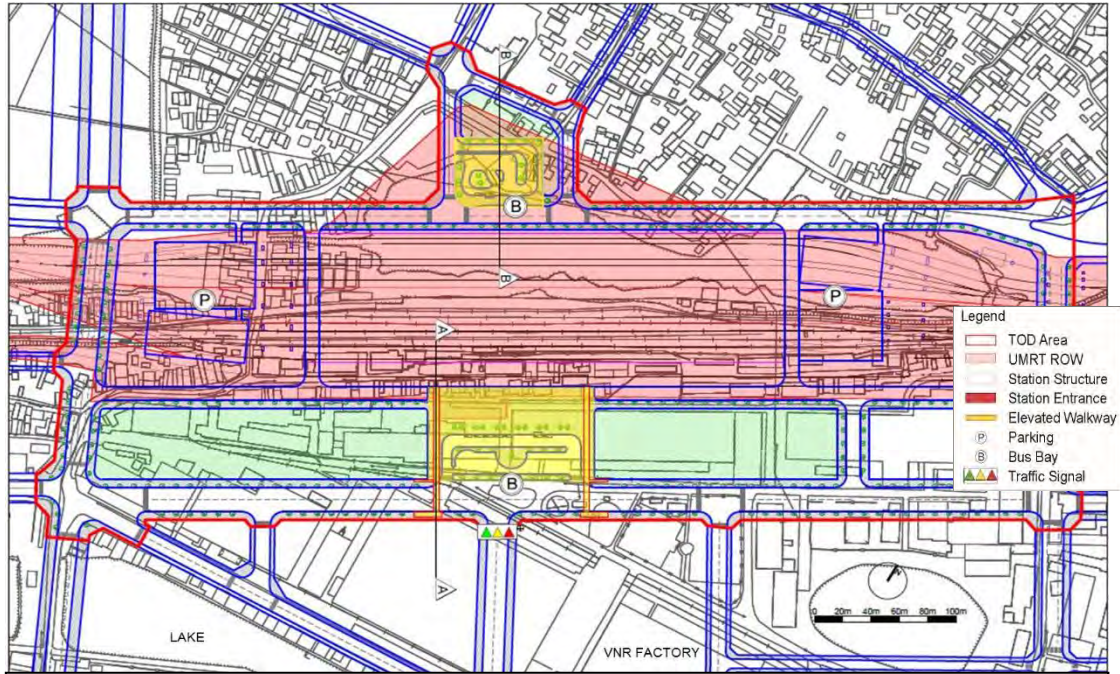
Facility Concept Plan at Gia Lam (V4) Station
